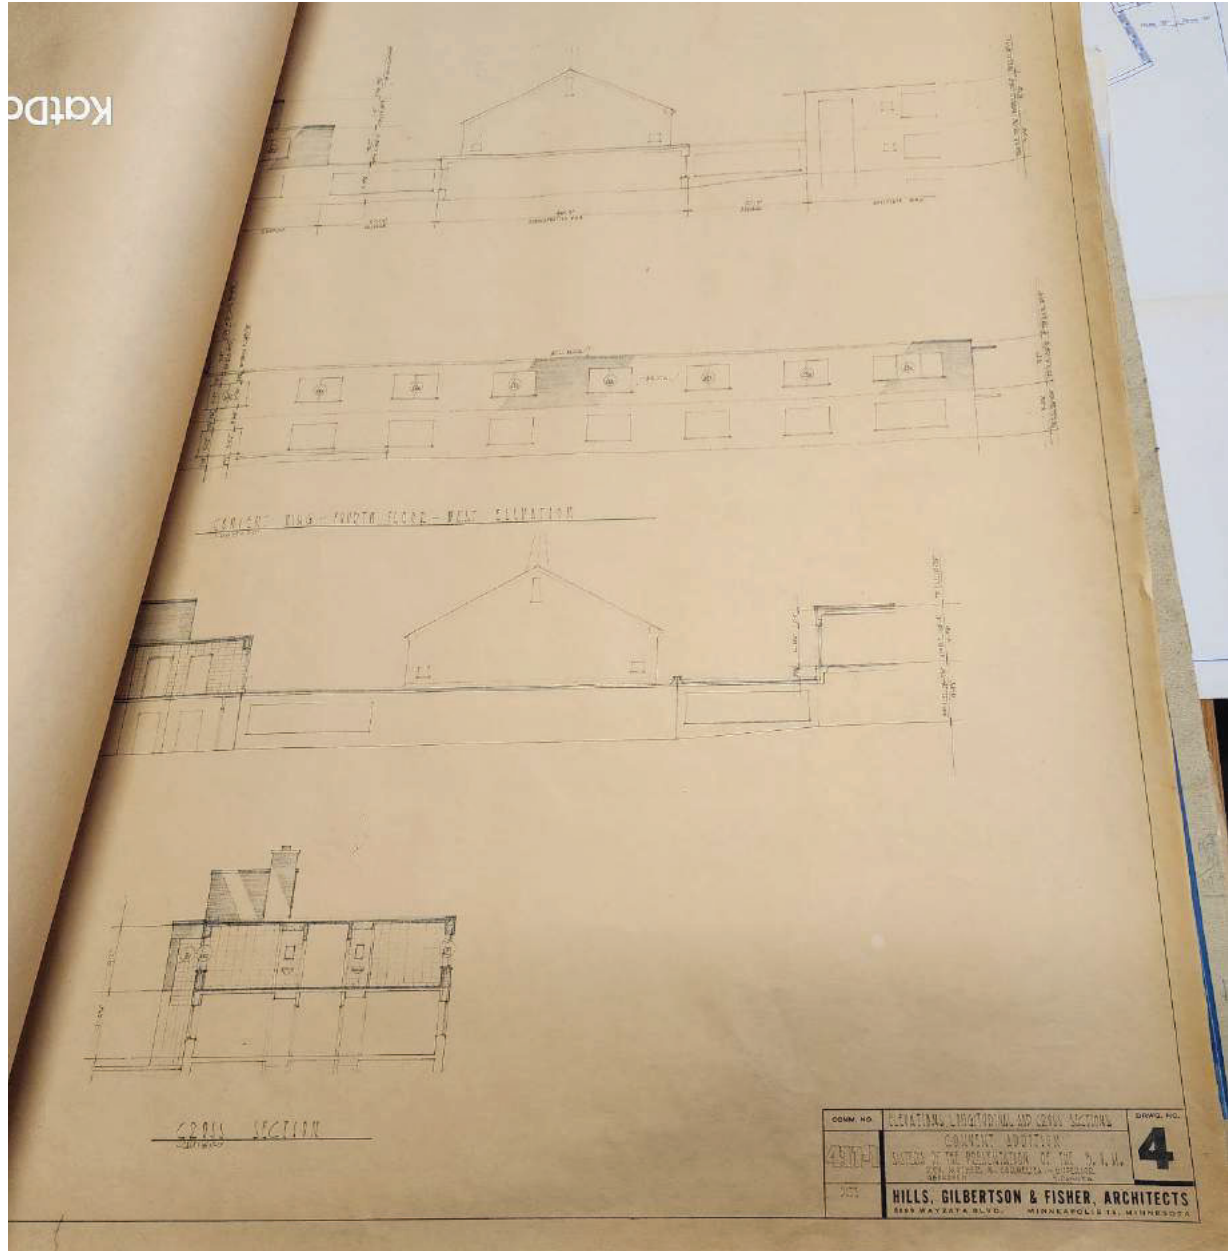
Convent Addition Elevations, Longitudinal, and Cross Sections
